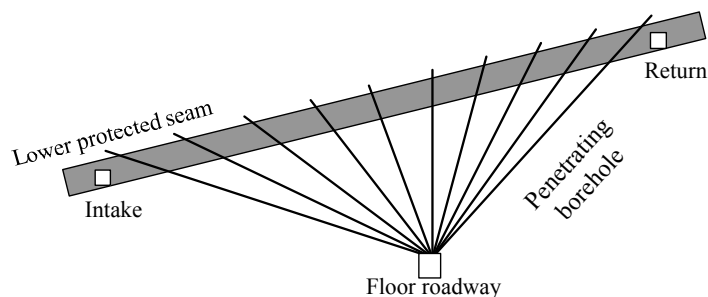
Layout inclination diagram of the grid-type penetrating borehole in floor roadway
